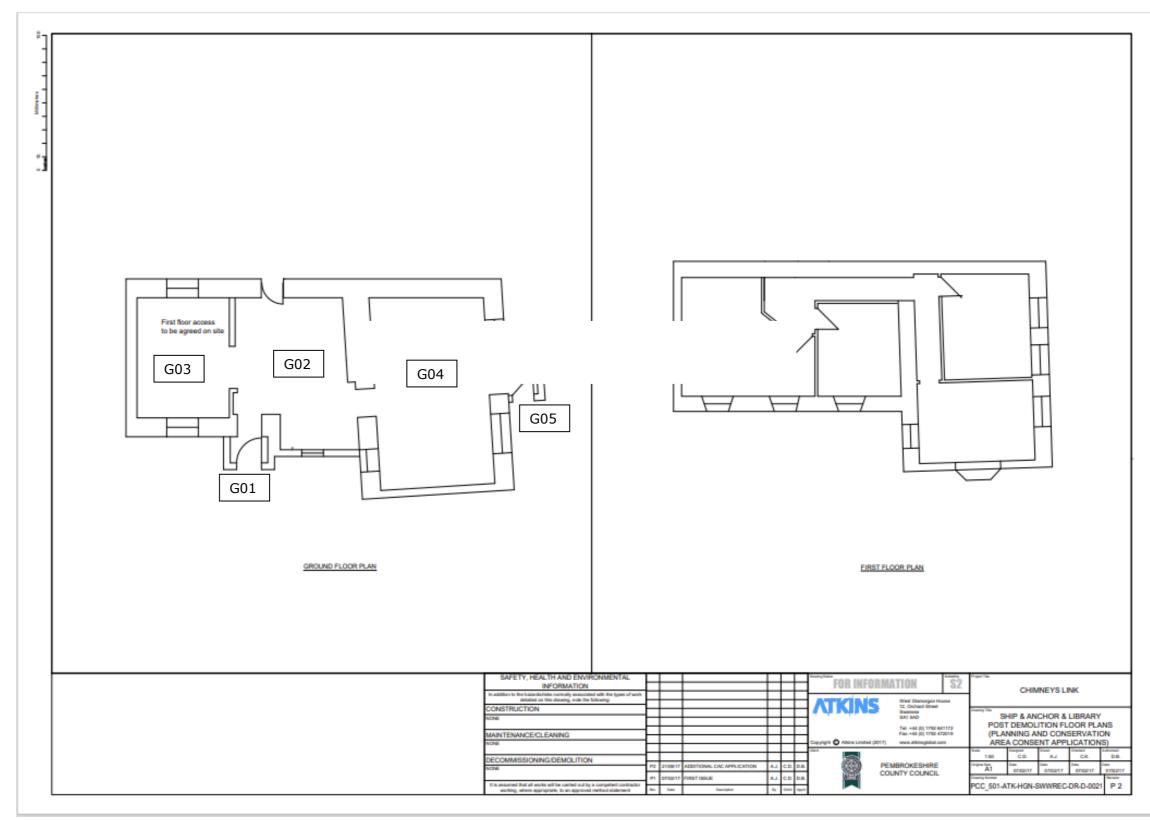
Floor plans of the former Ship and Anchor public house. Supplied by client.
